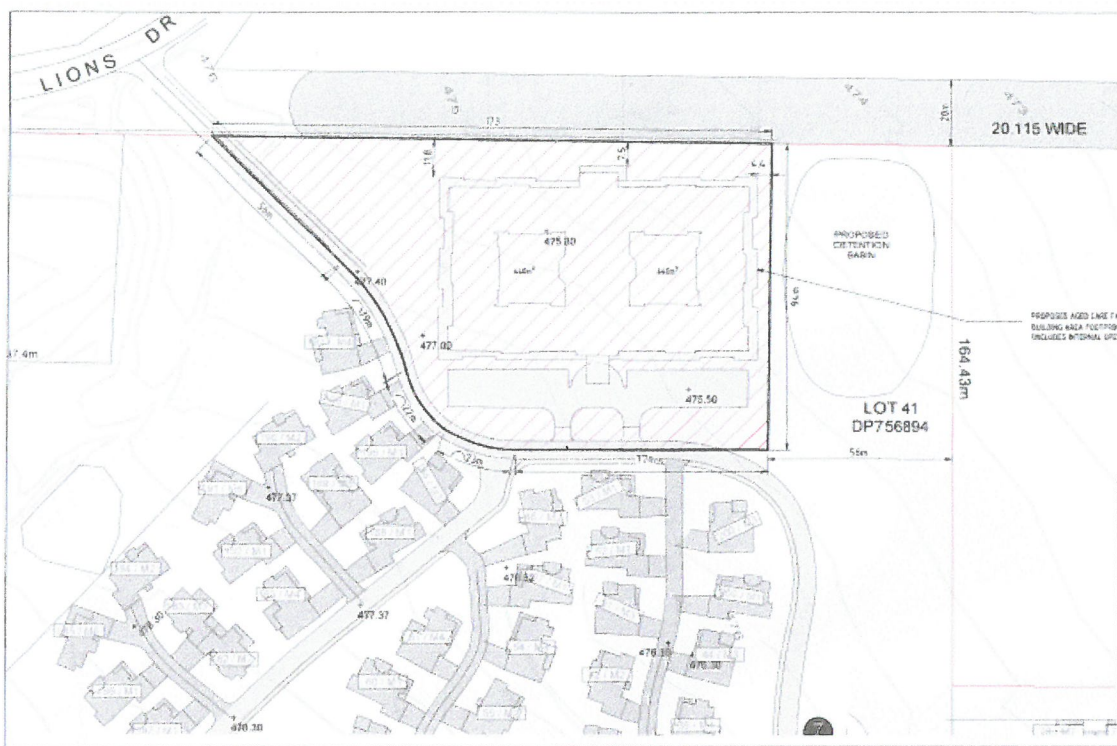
Plan of 80 bed ACF on 12410m<sup>2</sup> lot
